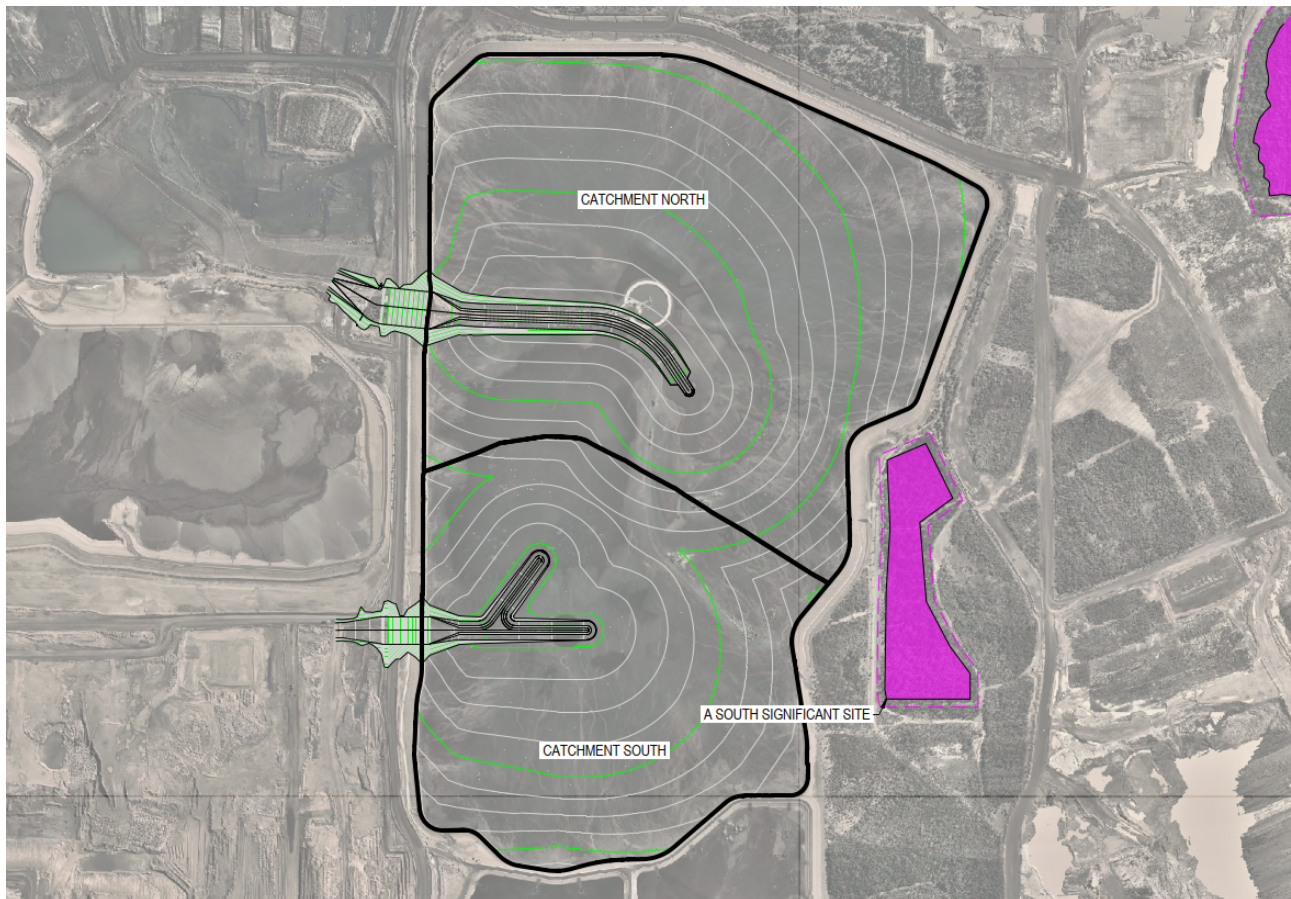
Tailings storage facility closure landform and outlet drain arrangement
